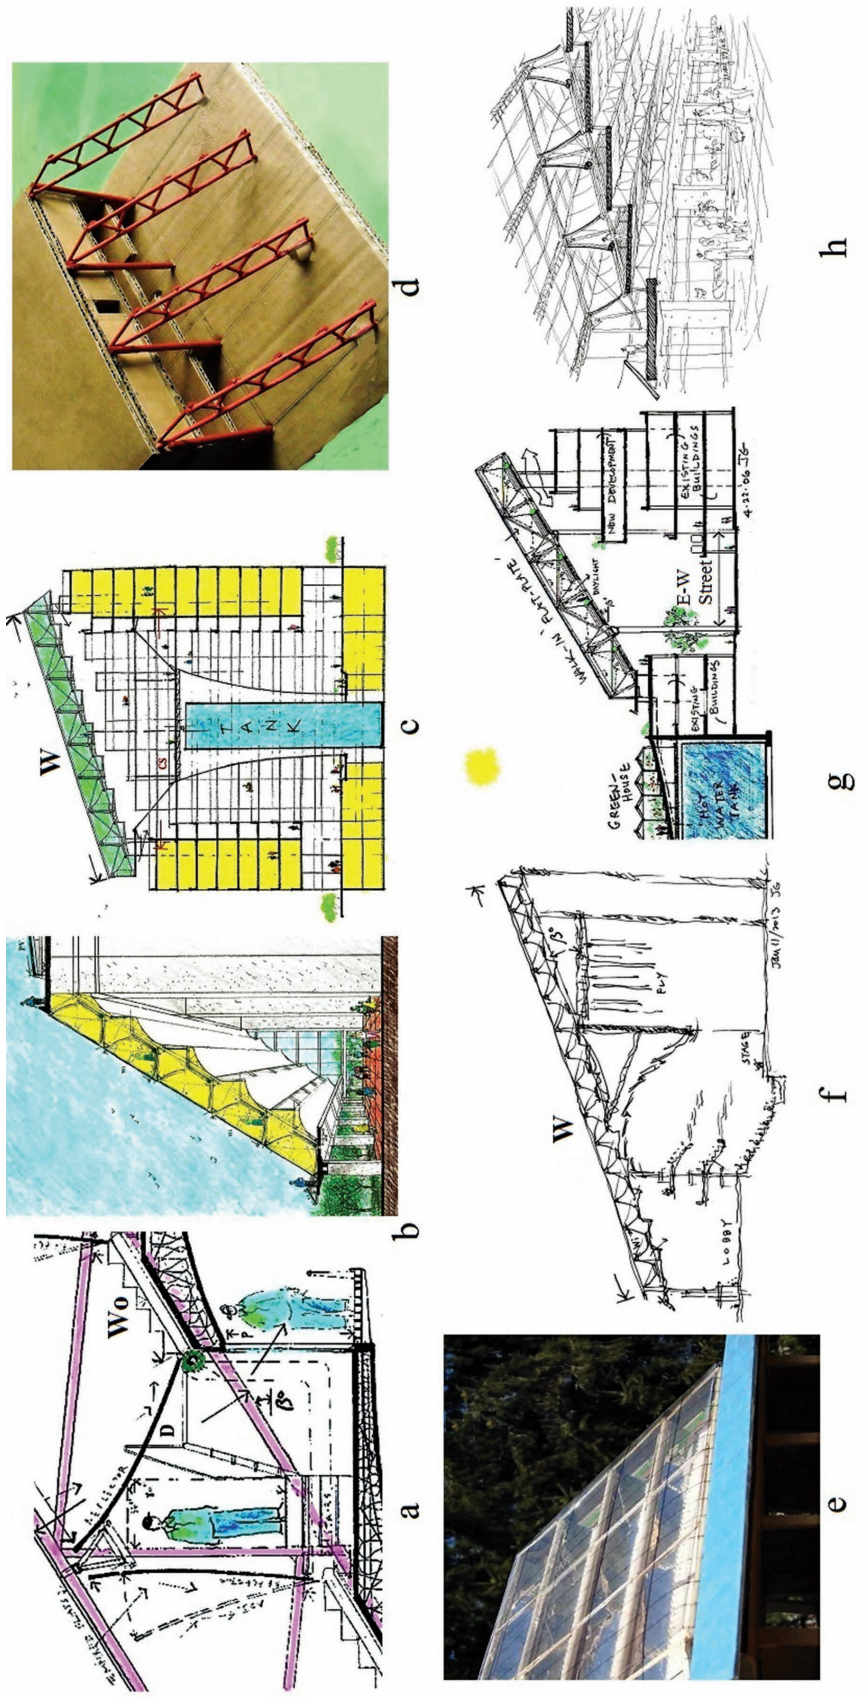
BITNR Long-span roof/wall building type application studies.
